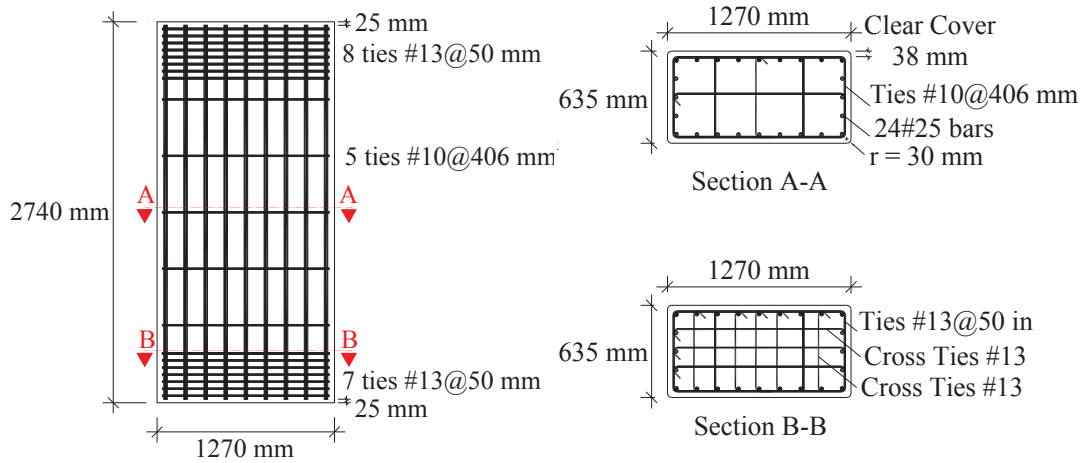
Schematic of Reinforcement Layout - Specimens Series H.
